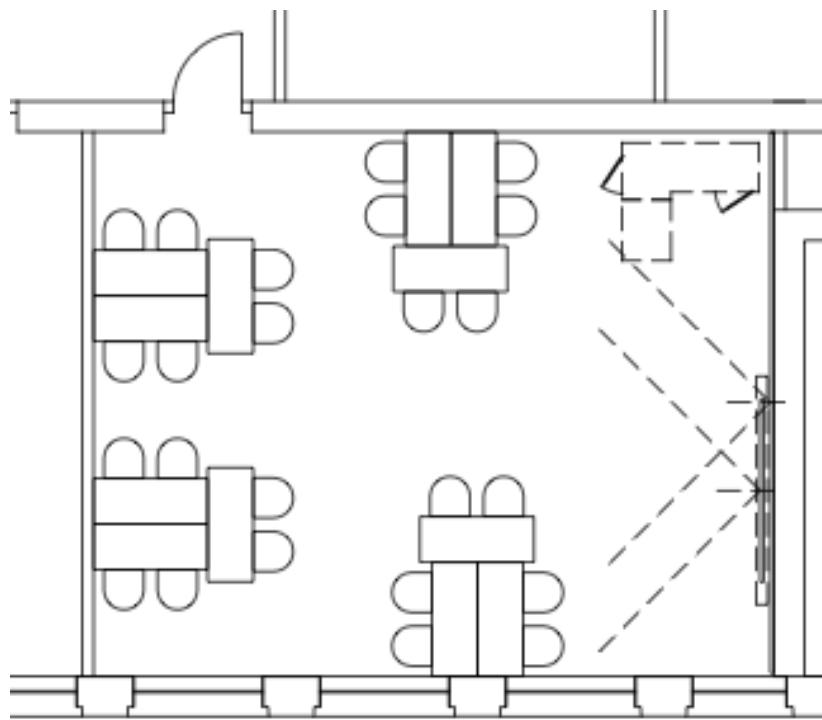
Floor plan for the pilot “bring-your-own-laptop” room.
